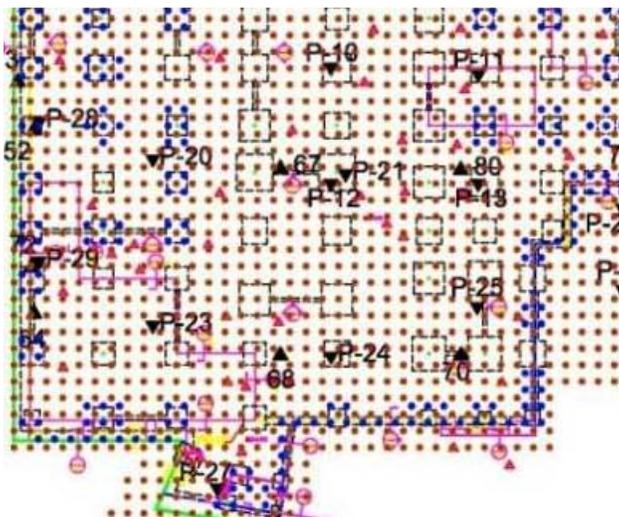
A partial stone column layout, as well as the locations of pre-improvement and the post-improvement CPTs
